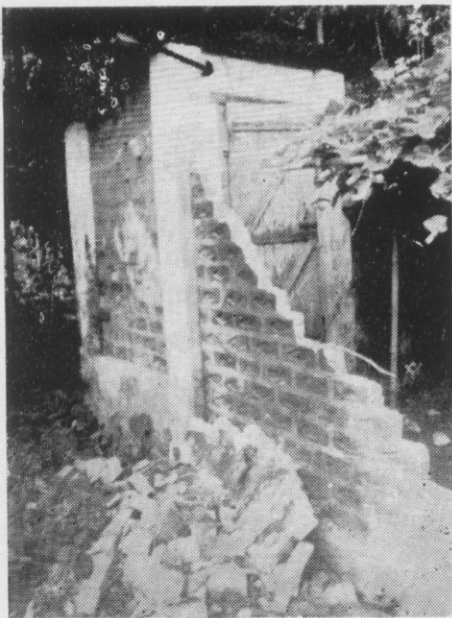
Complete collapse of brick masonry walls (including partition walls) in a school building at Sonaimukh-some wooden window frames remained hanging on the rear face.
